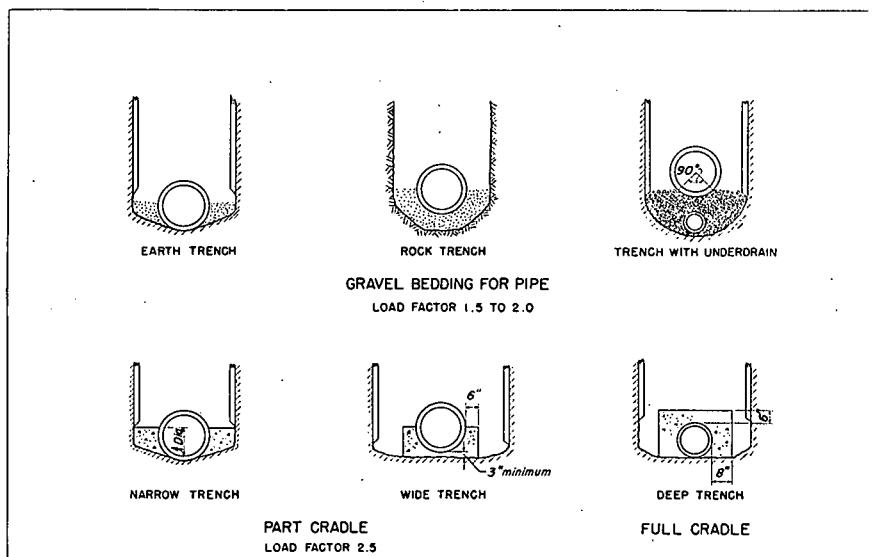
TYPICAL SECTIONS OF TRENCH
